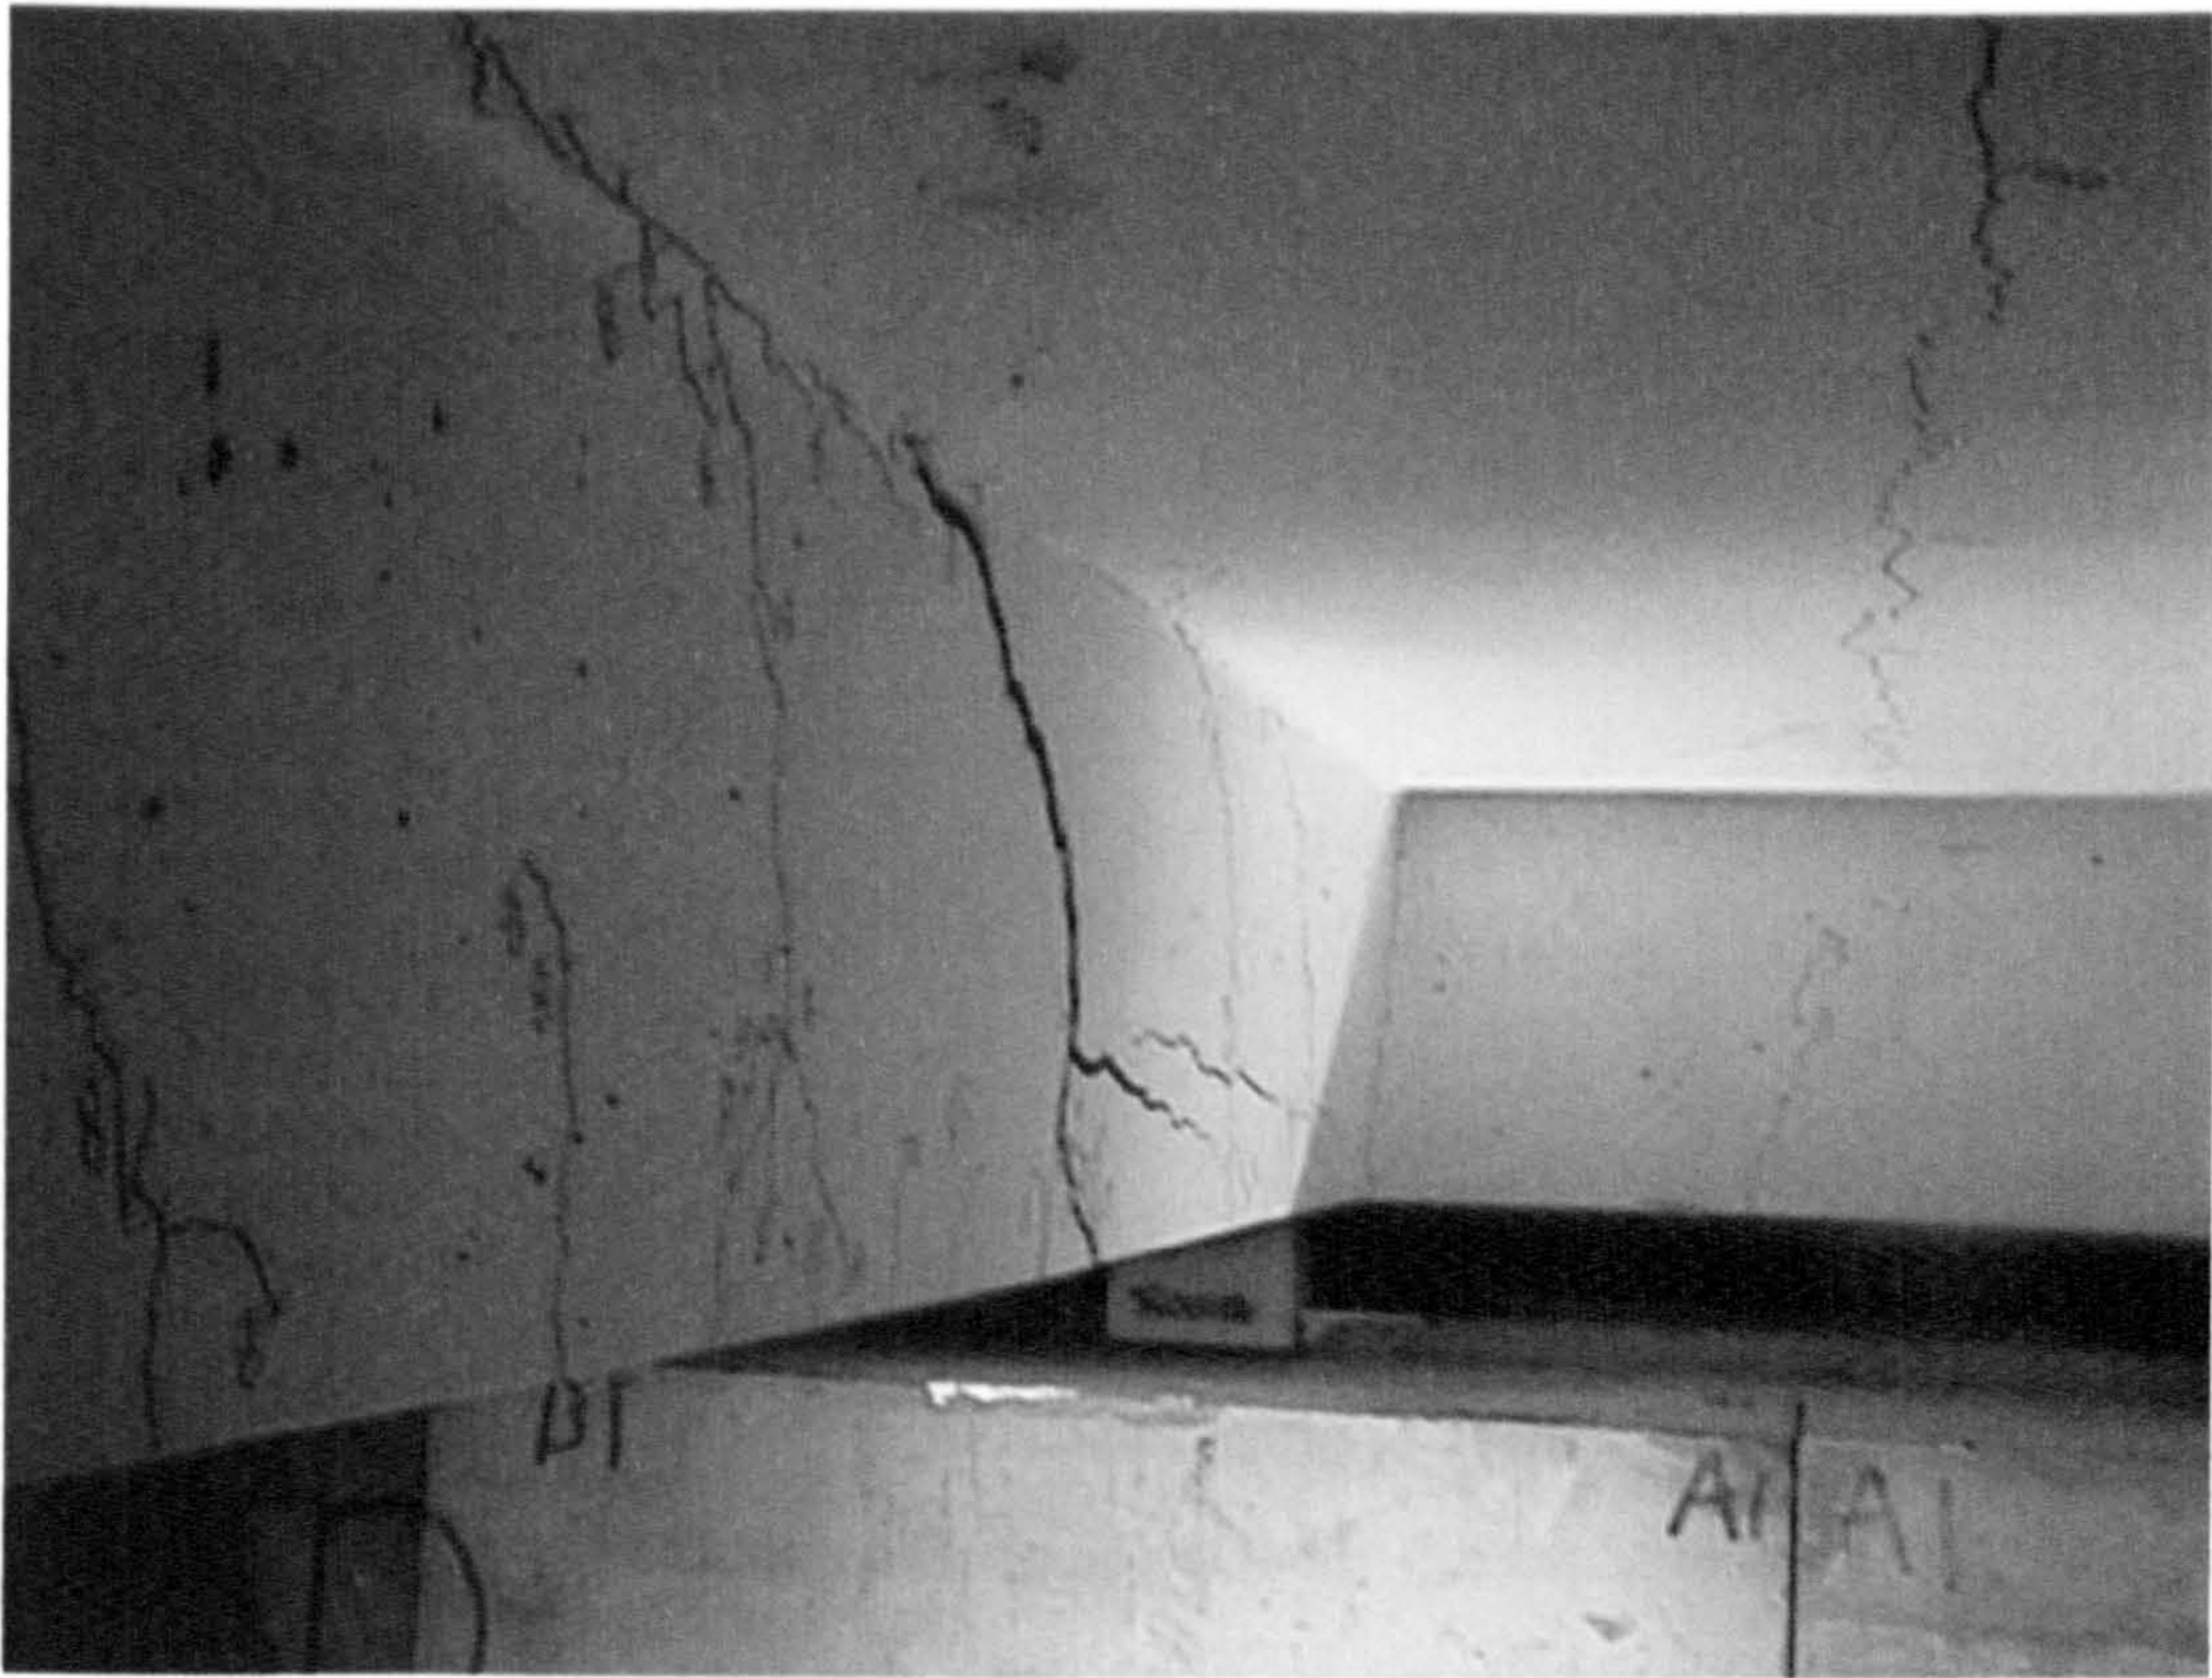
Deck 4 shear cracking at failure in beam ii
